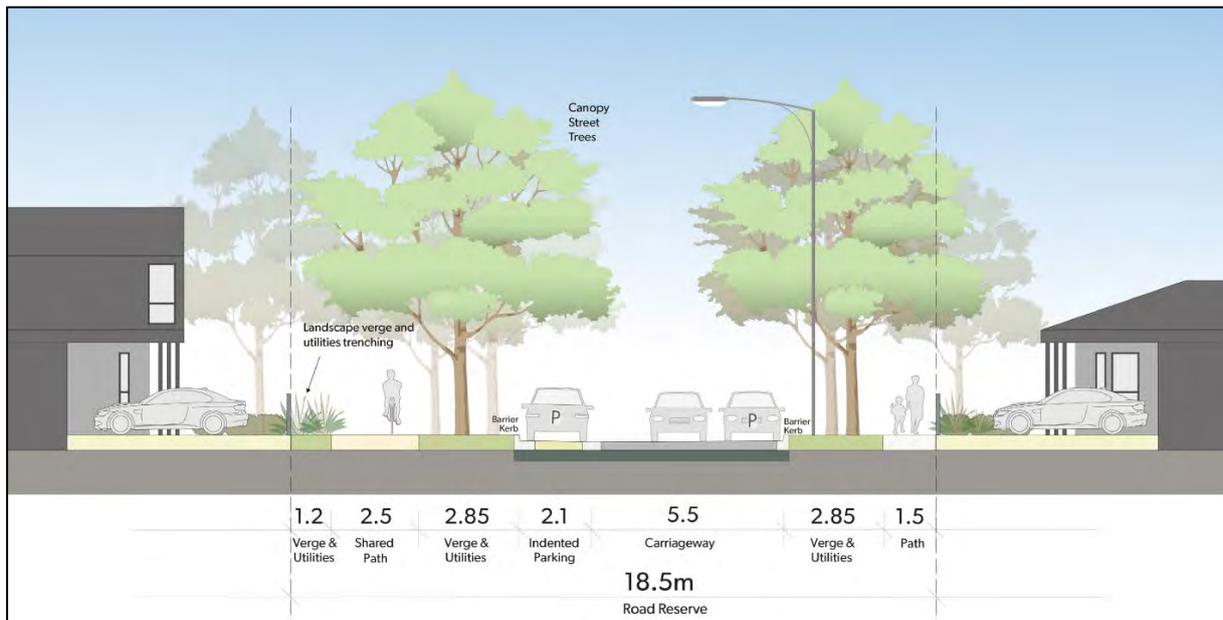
Shared Path Avenue Local Access Street Cross-Section
